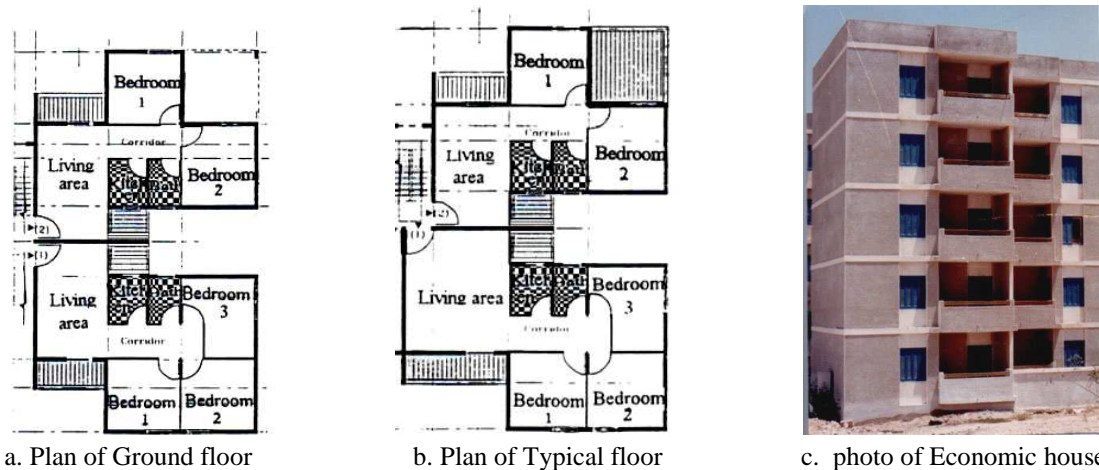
Plans of the ground and typical floors and a photo of low-cost house case No. 1
